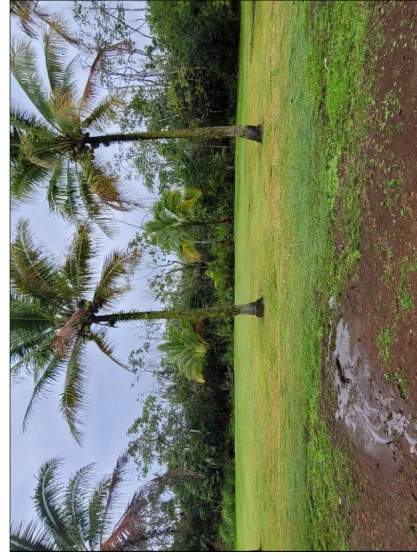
Photo overlooking the open, graded perimeter area in the southwest corner of the property outside the plant security fence, where a future warehouse building is planned; view to south
